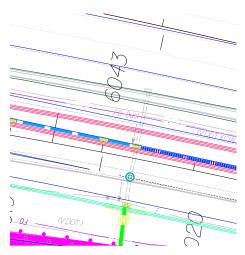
Shift reversible lanes southwards with new EOP and barrier
